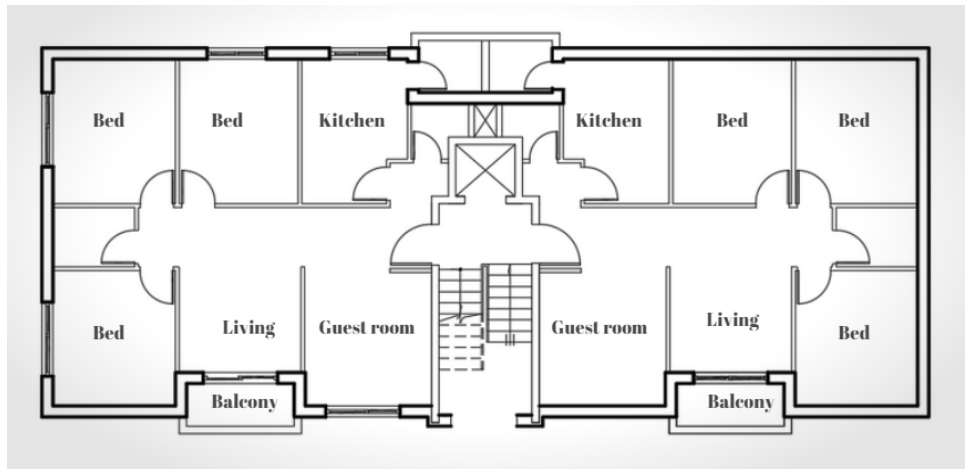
Typical apartment design (Engineering House Consulting Company)
